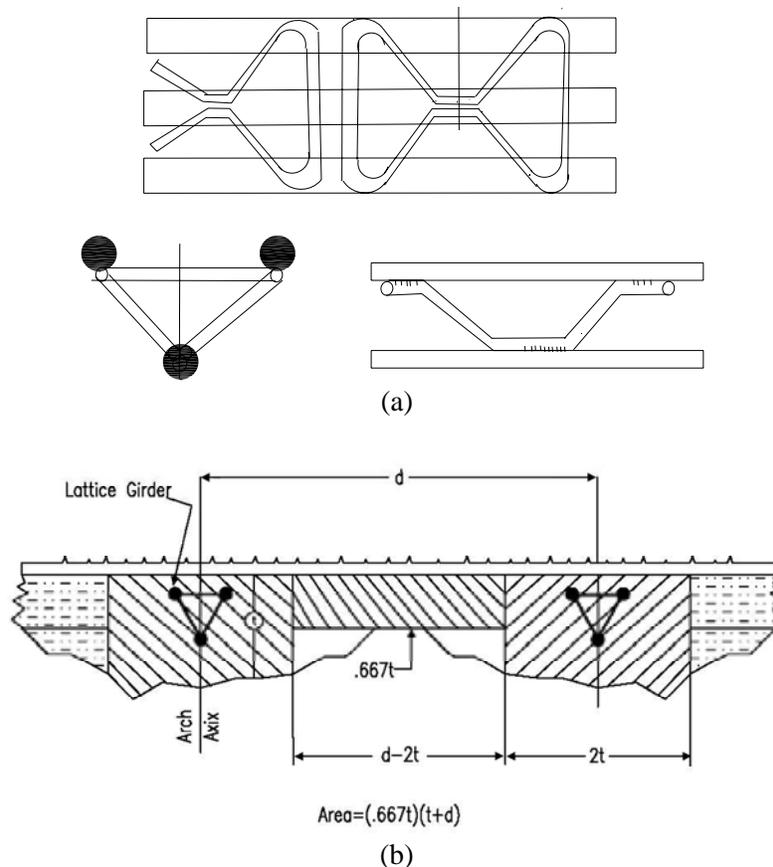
(a) Lattice Girder Configuration (Emilio-2-2901-1997); (b) Estimation of Cross Section for Shotcrete-encased Lattice Girders (Emilio-2-2901-1997)
